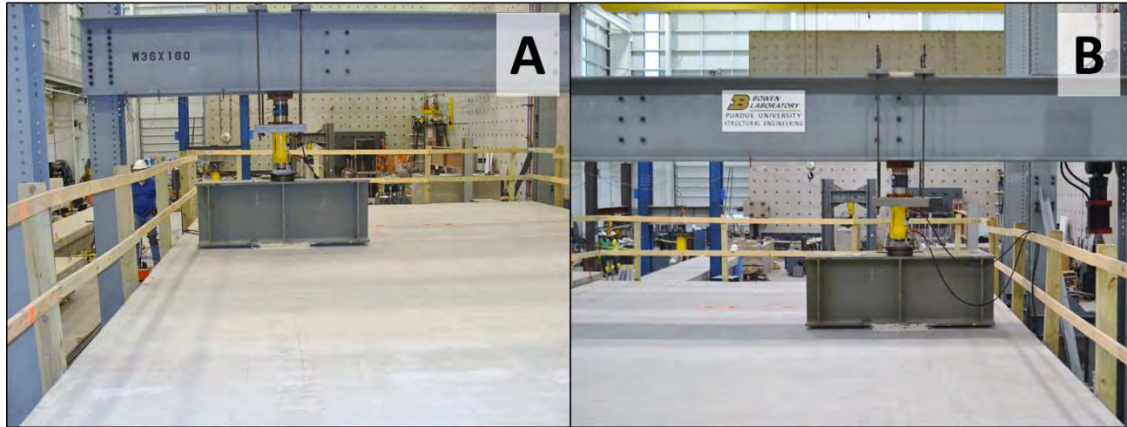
Test 11 (A) & Test 12 (B) load set-up at Section E (looking south)
